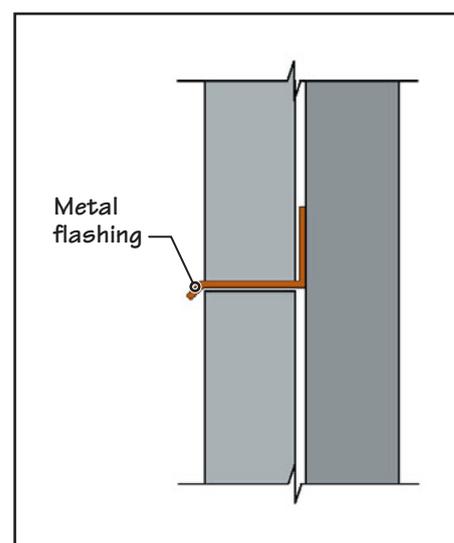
L-flashing at a horizontal butt joint. If the projecting part of flashing is turned down at a 90° angle instead of a 45° angle, it is referred to as Z-flashing.
